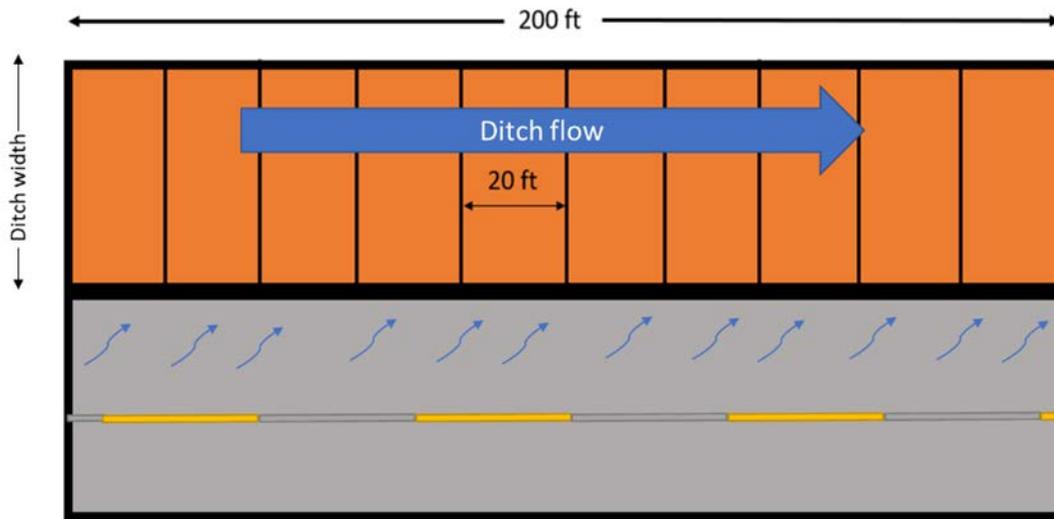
Arrangement of 20-foot wide vegetation plots in treatment section 1
